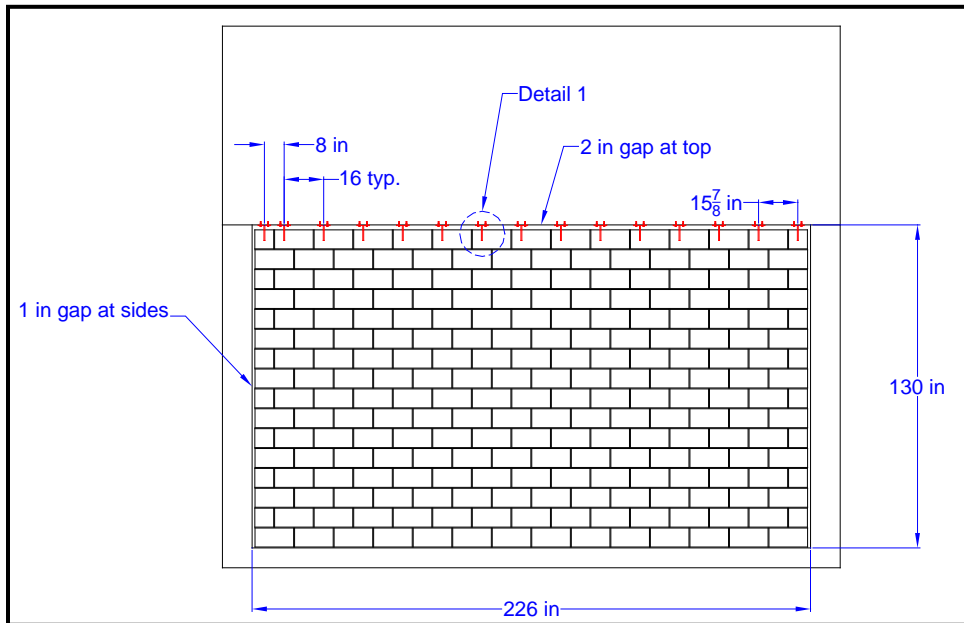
Typical CMU wall construction details for Bays 1 and 2.
